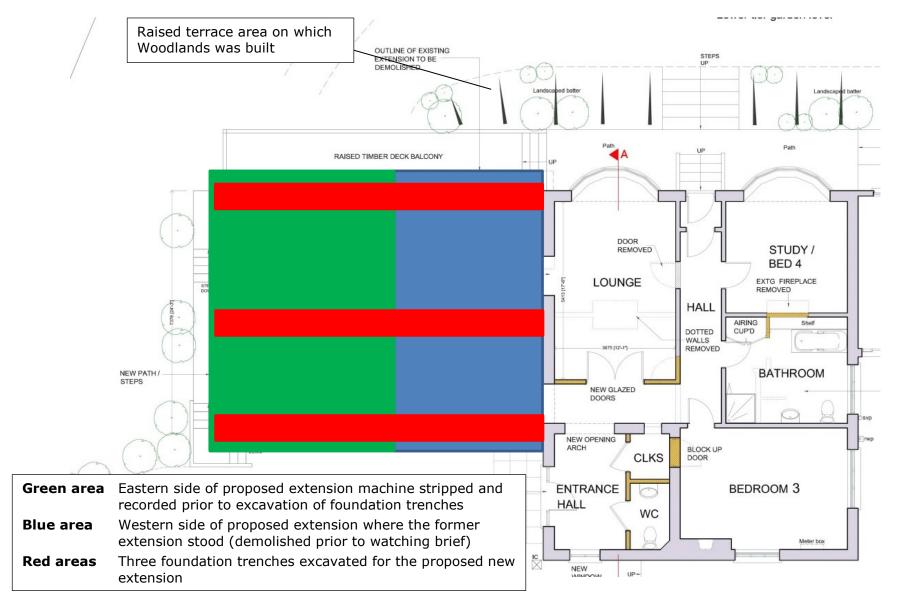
Watching brief areas discussed in text overlain on proposed ground floor layout of the extension (plan supplied by client).
